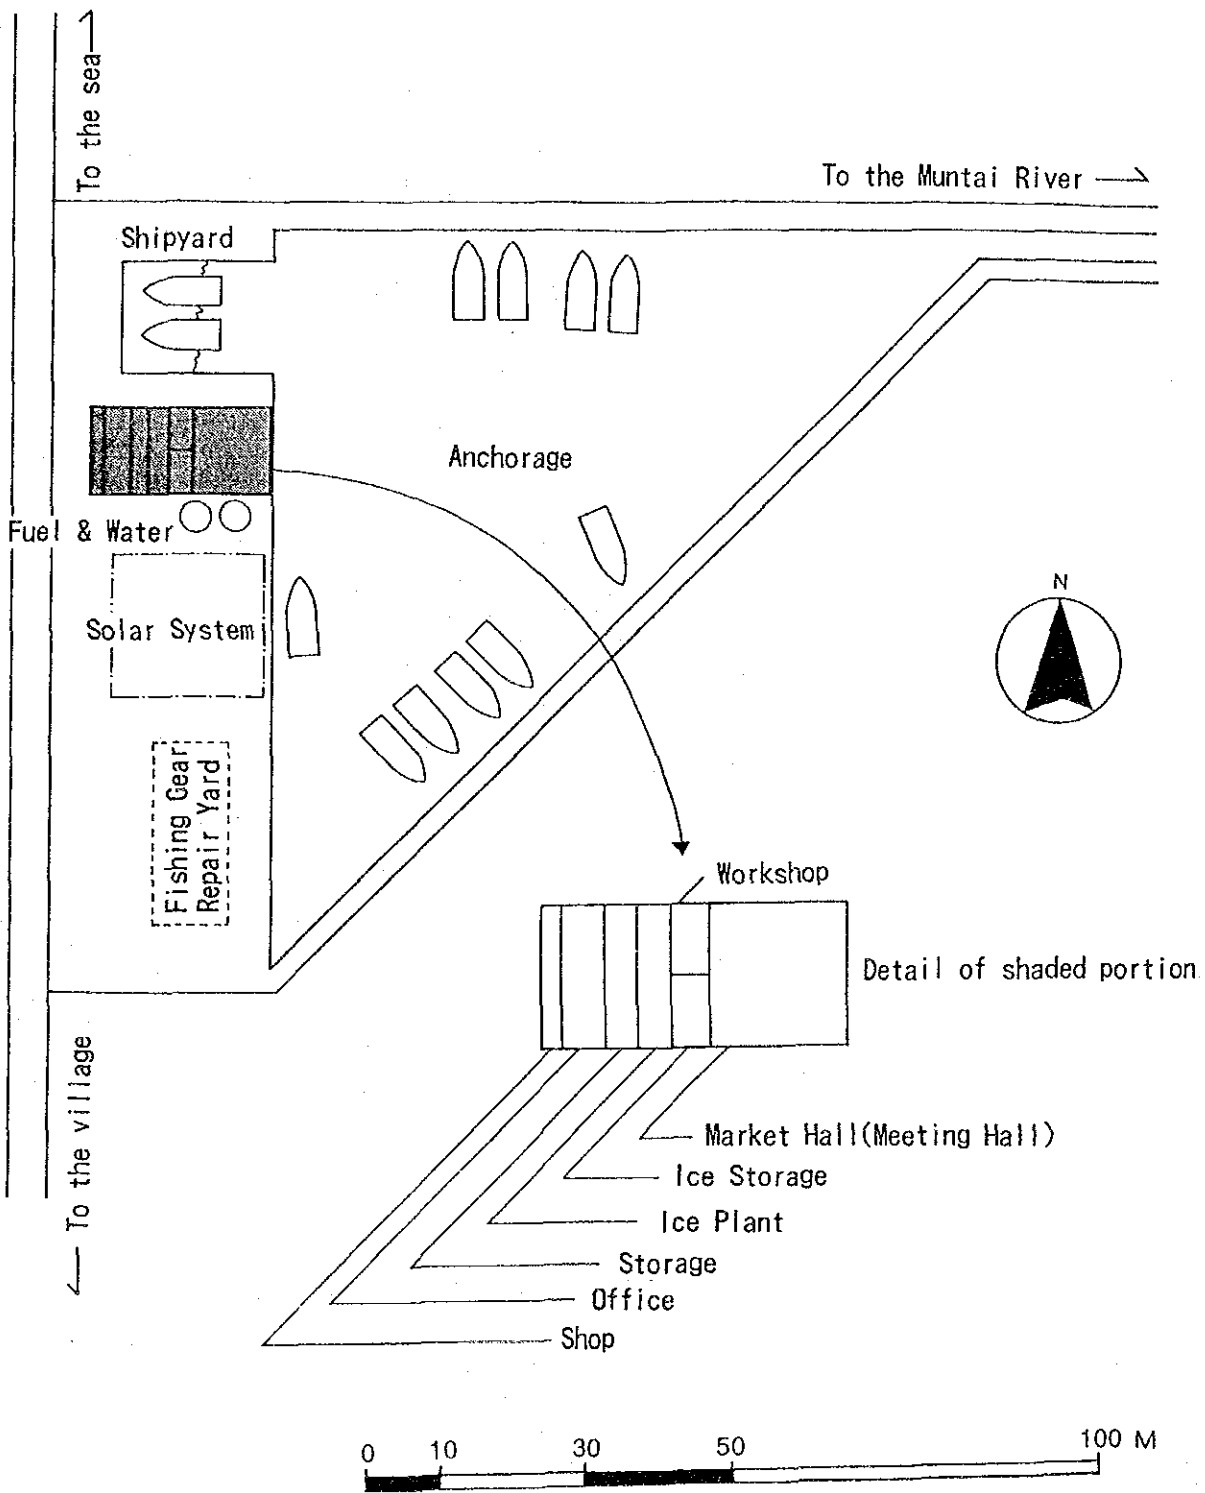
Layout of Planned Facilities in Desa Muntai (2/2)
